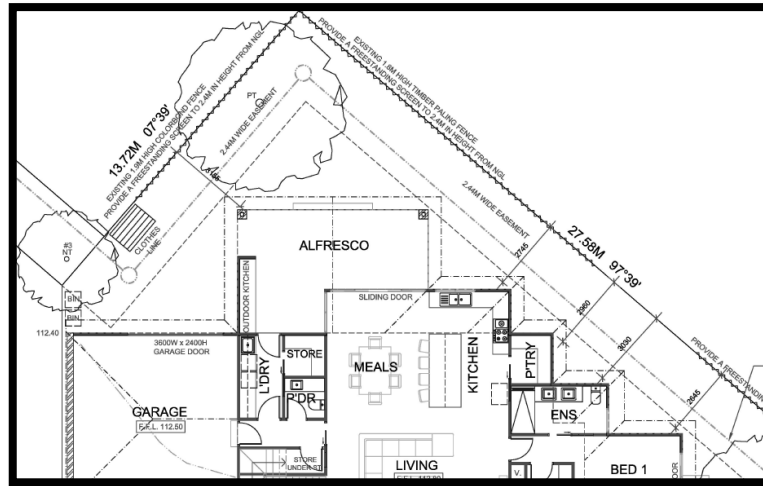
part ground floor plan showing alfresco area.<sup>8</sup>
